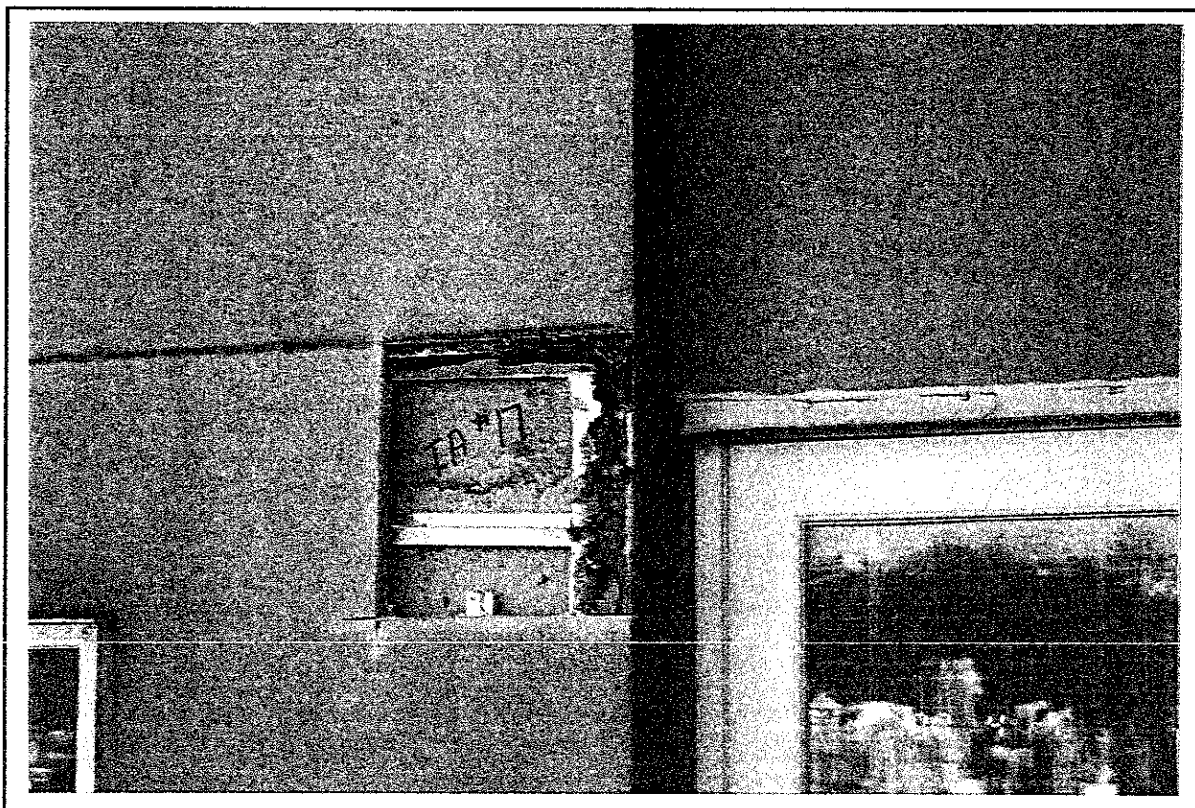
Test Area #17 – Concrete column / furring in good condition
